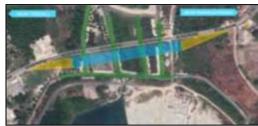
Location of the Nibung Baru Bridge Construction Project
